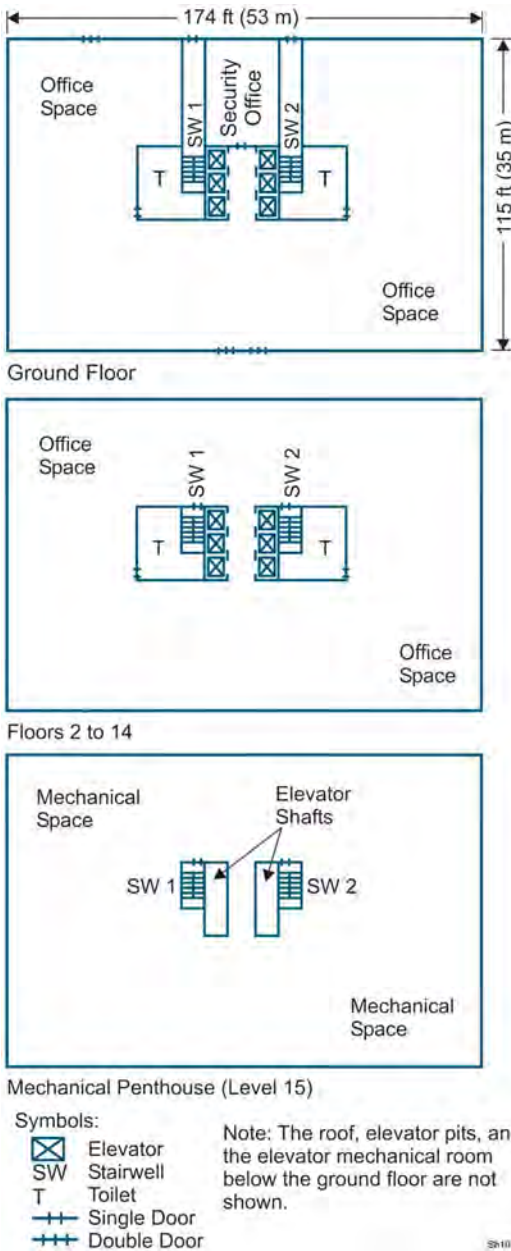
Floor plans of the example 14 story open plan office building for elevator pressurization study
